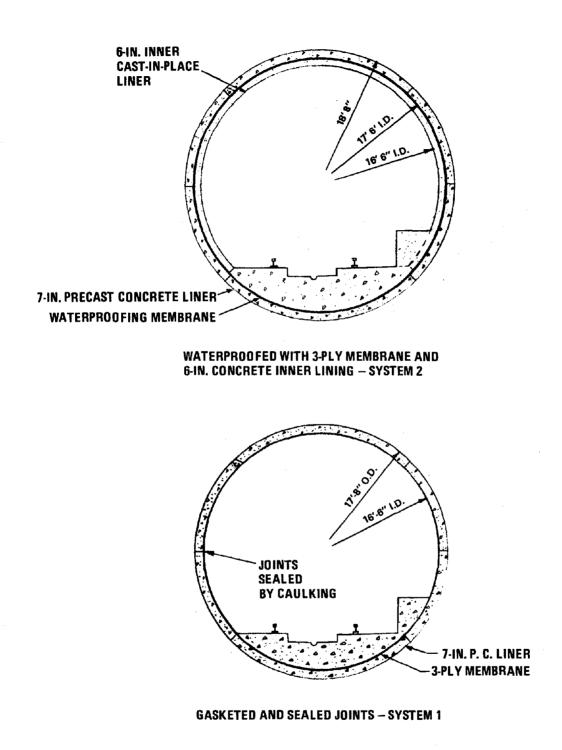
TRACK TUNNEL WATERPROOFING SYSTEMS
